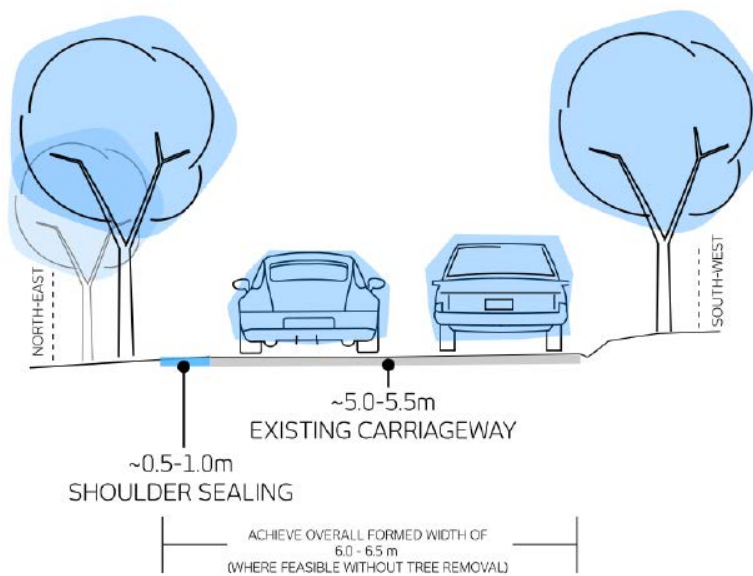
High-level cross section of the potential shoulder sealing arrangement (Source: CIRQA).
